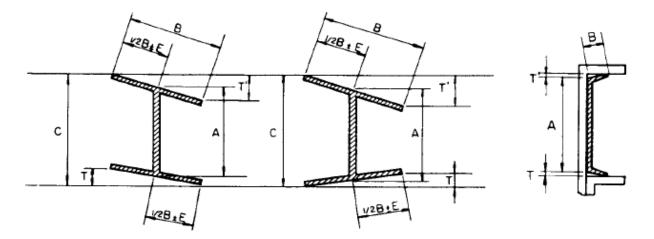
Mill tolerances on the cross-section of a W-shape.
